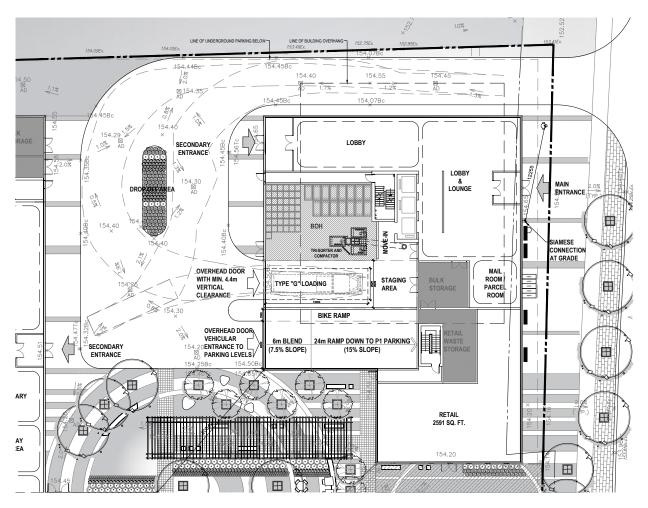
Plan showing Waste Movement and Circulation on Site
